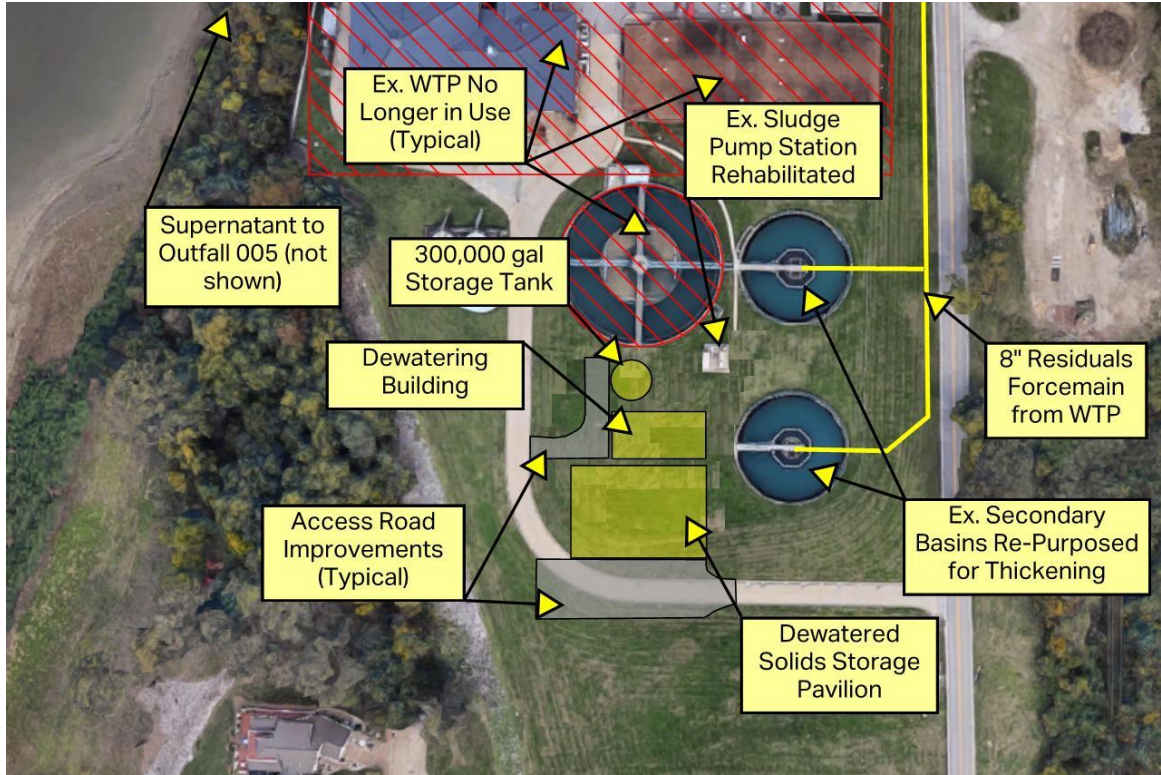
Conceptual Layout of South Plant Dewatering Facility
